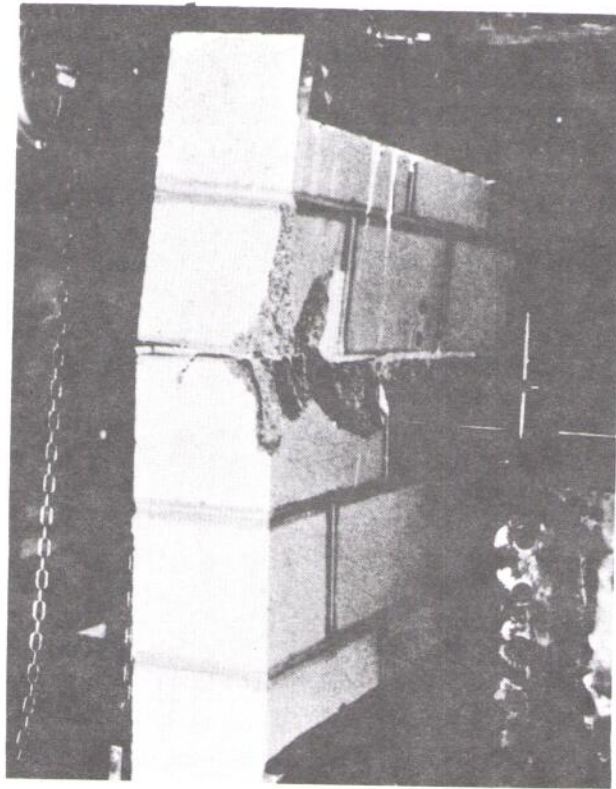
Failure of eccentrically loaded hollow concrete block masonry wall
